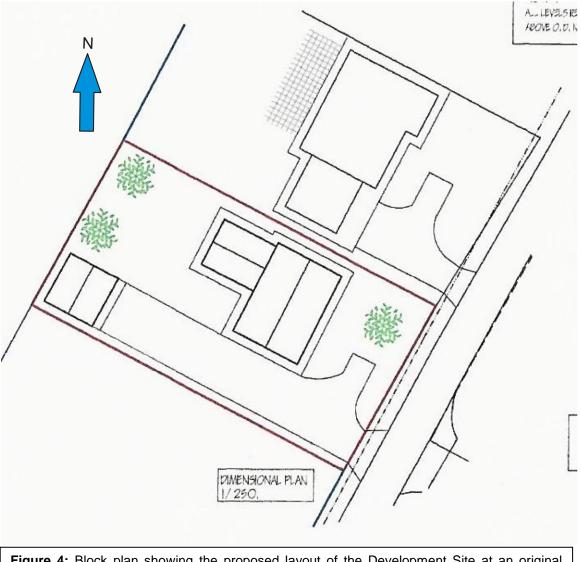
Block plan showing the proposed layout of the Development Site at an original scale of 1:250, (not to scale), (extract from Architects plan).
